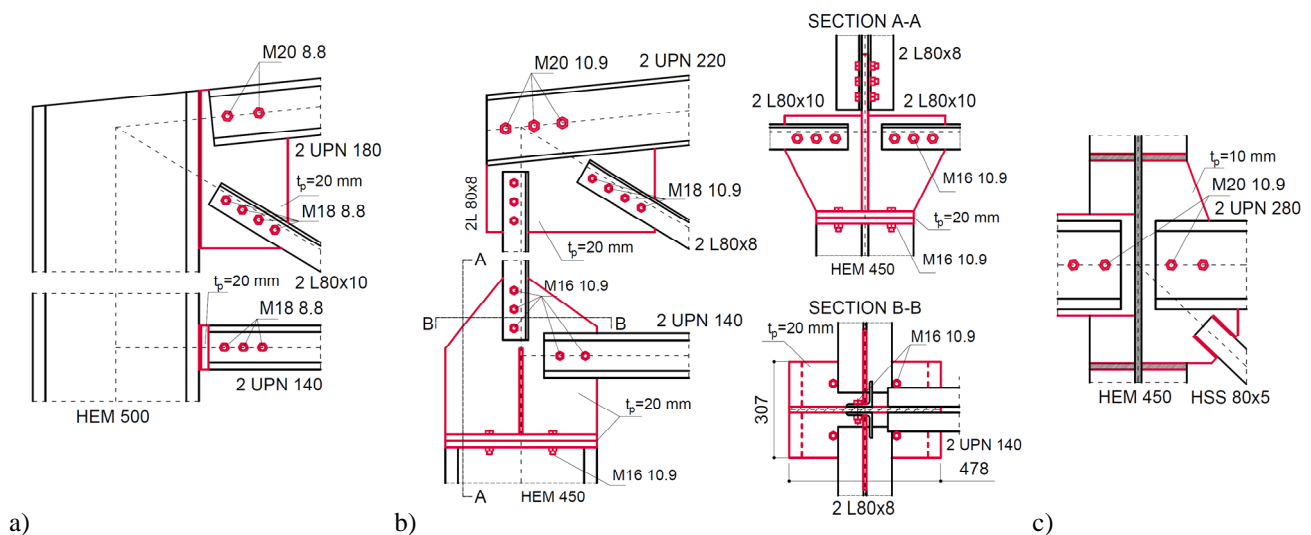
Transverse truss-to-column connections: (a) PCB case and (b) SCB case; (c) Longitudinal bracing connections
